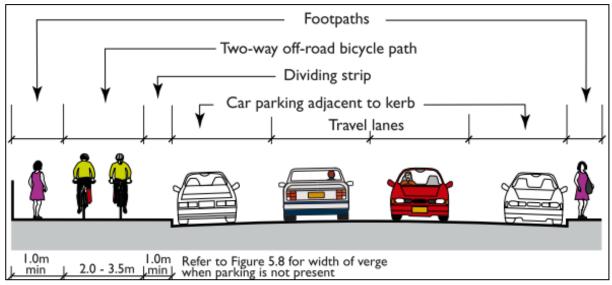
Typical Cross-Section - Two- Way Off -Road Bicycle Path on One Side of Road
